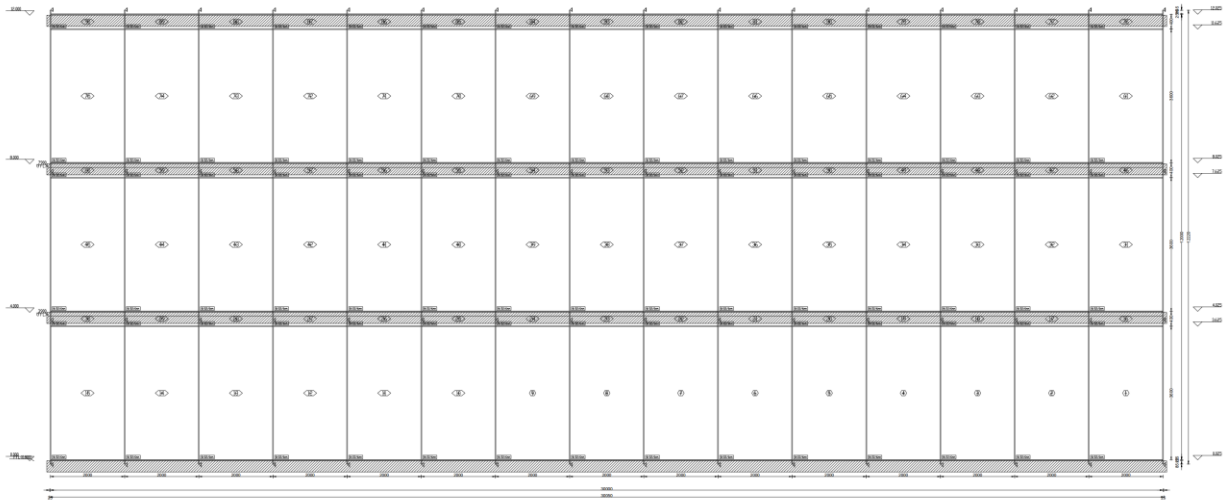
Technical elevation drawing on curtain wall (glass facade).
